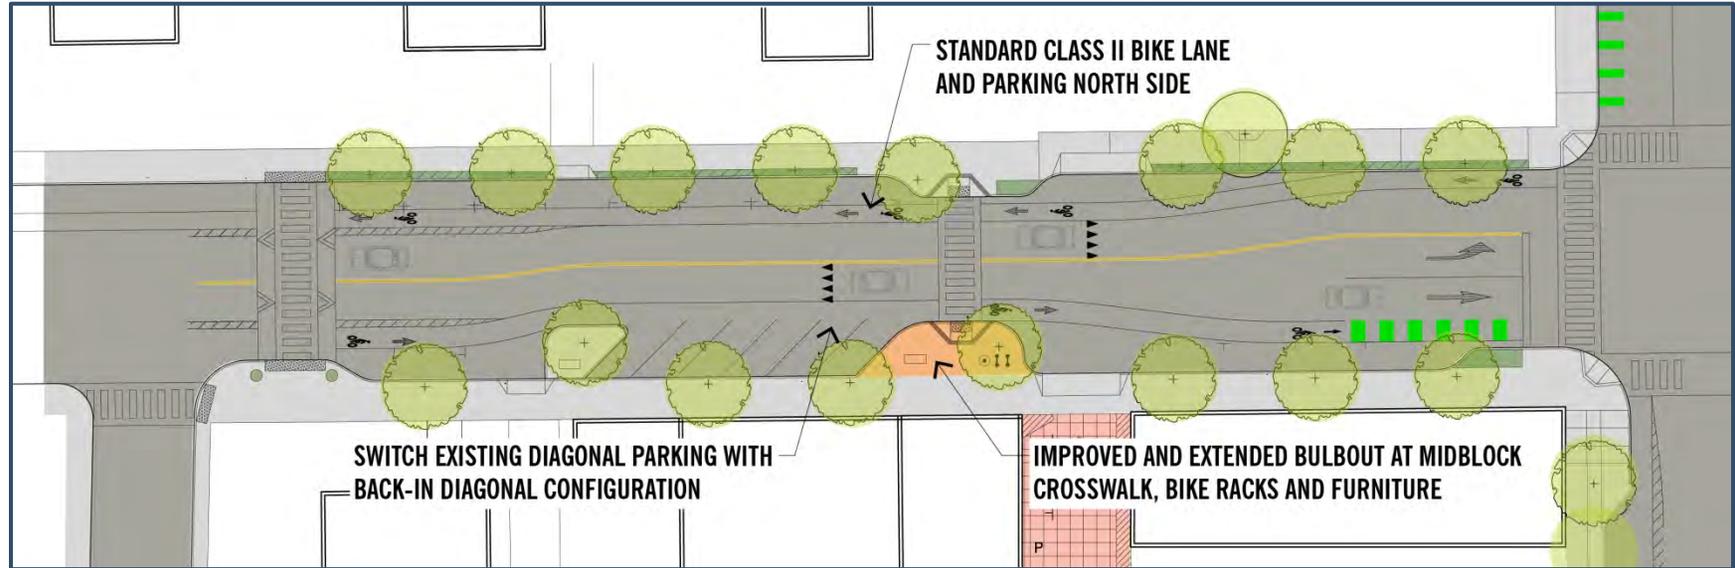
Alternative – West Commercial Street at Main Street Intersection with Back-in Diagonal Parking
